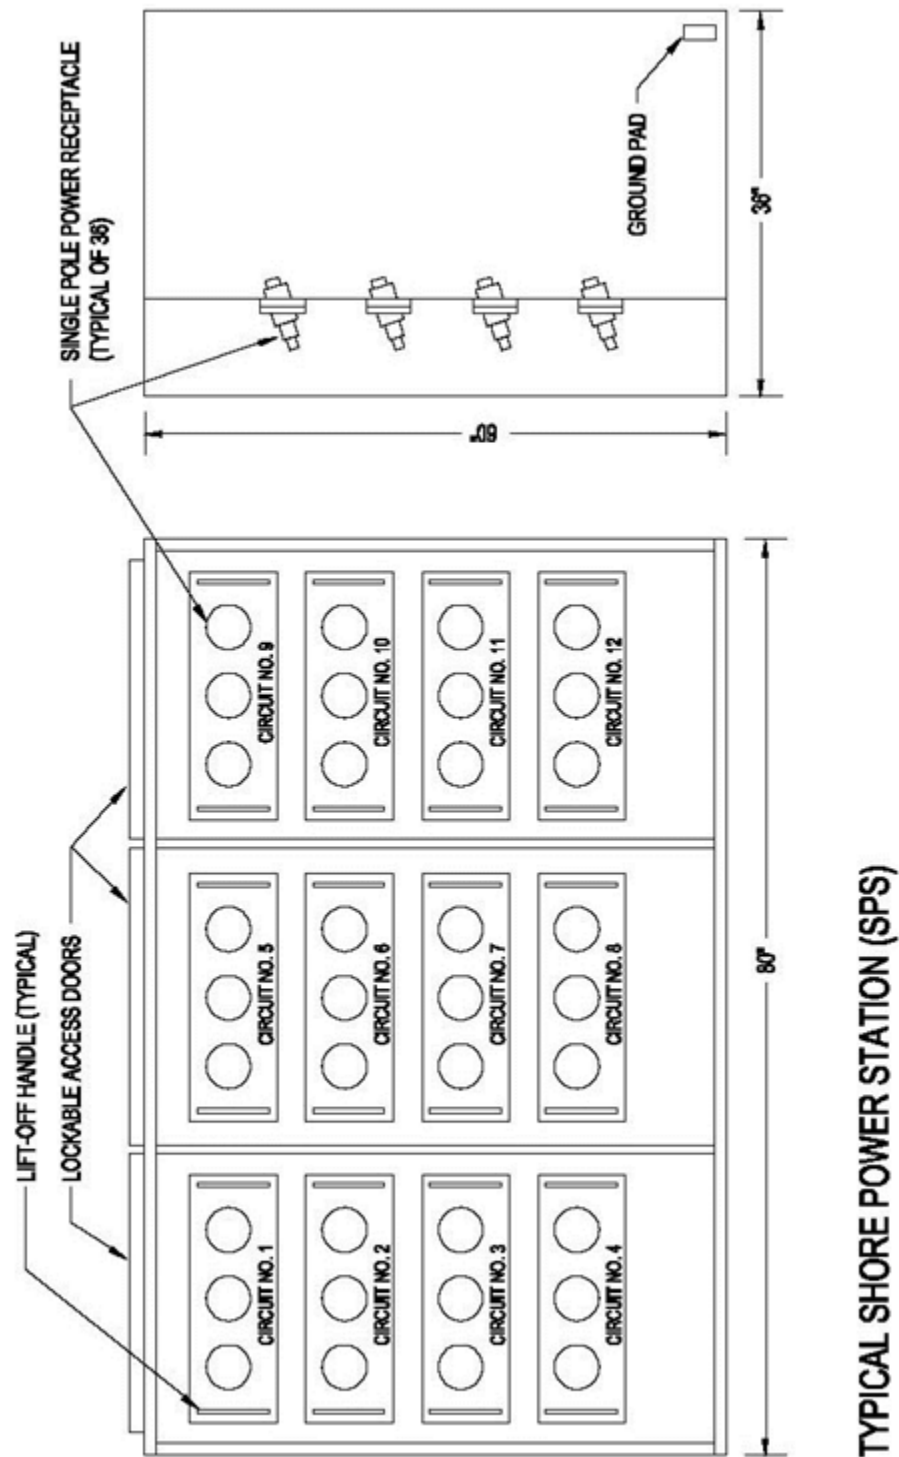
(a) Pier Electrical Distribution: Typical Vault System (1 of 5)
